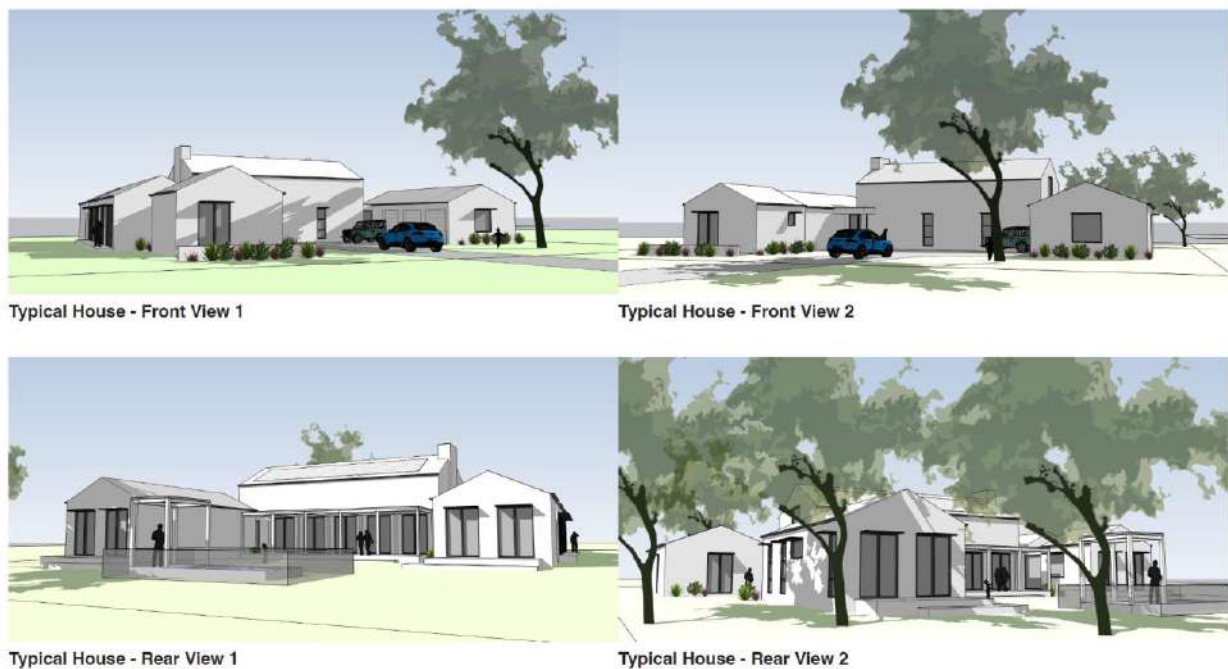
Typical proposed dwelling for five dwelling development; adapted from Group Architecture Plans provided at Appendix 3.
